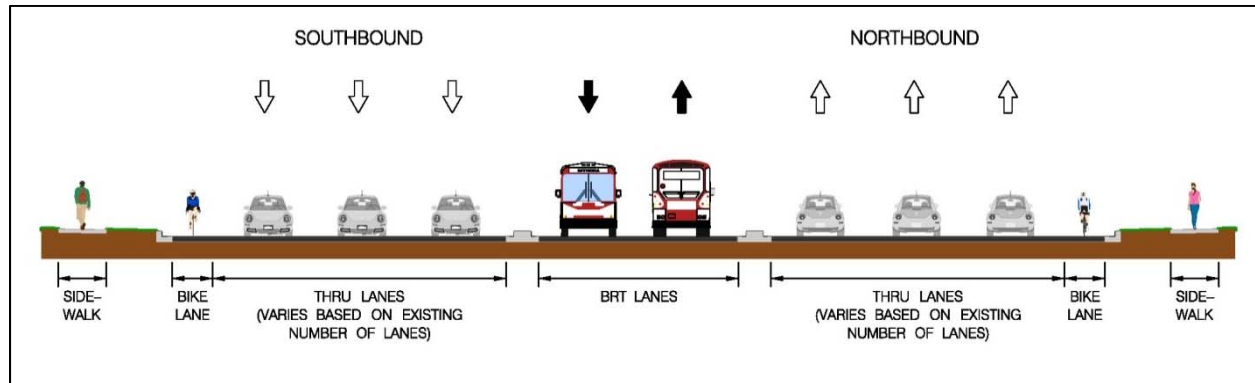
Alternative 3B - Section 3: Rockville Town Center
